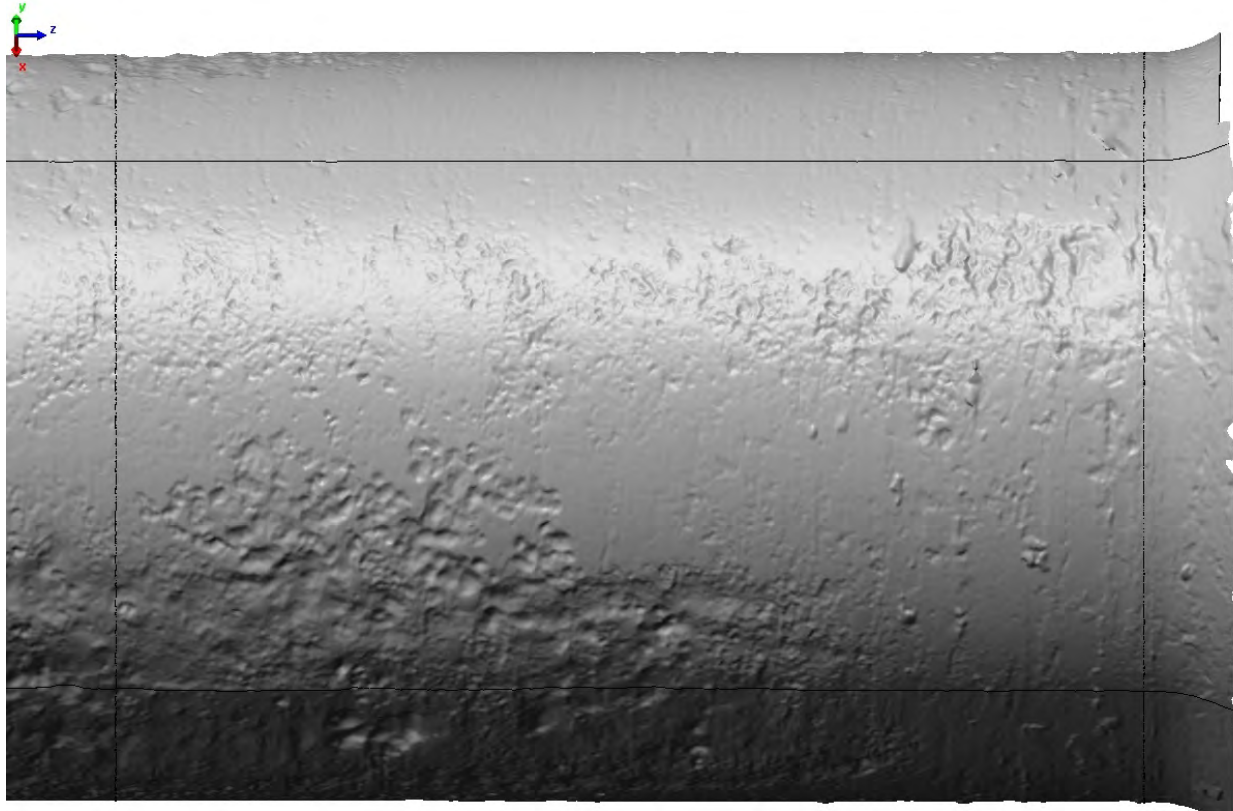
(16). Pipe 63, 9-12 feet and 90-180 degrees
